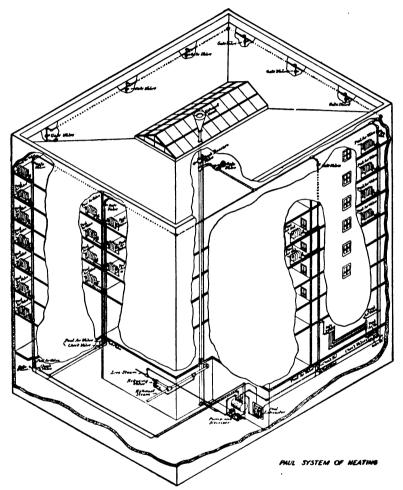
Showing General Method of Making Pipe and Radiator Connections in Paul System.
